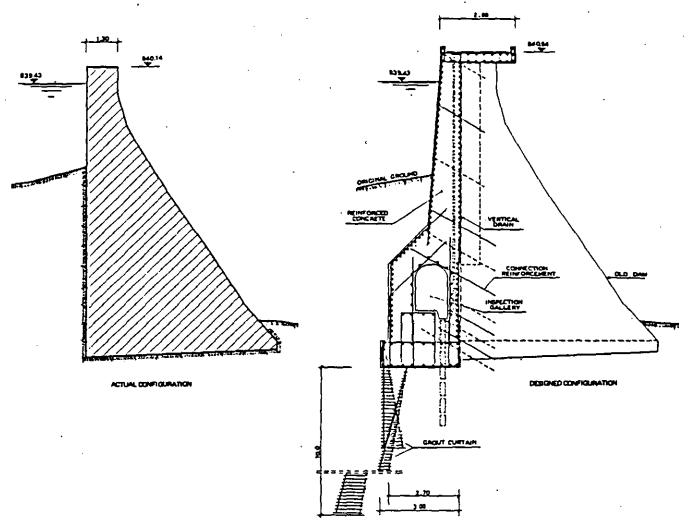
Typical sections of the Tres dams: actual and designed configurations
